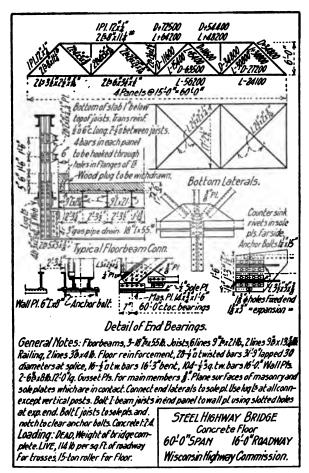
LOW TRUSS STEEL HIGHWAY BRIDGE. WISCONSIN HIGHWAY COMMISSION.
